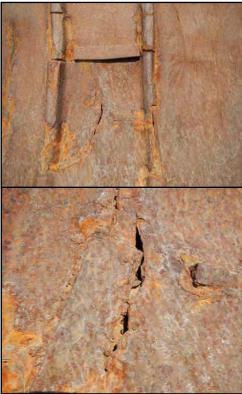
West Gold Dock large dent and cracking on Cell 8
